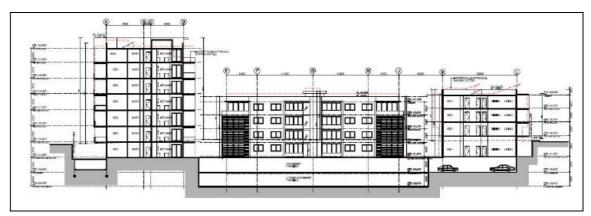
Section drawing through Buildings 1, 2 and 3 of proposed development
